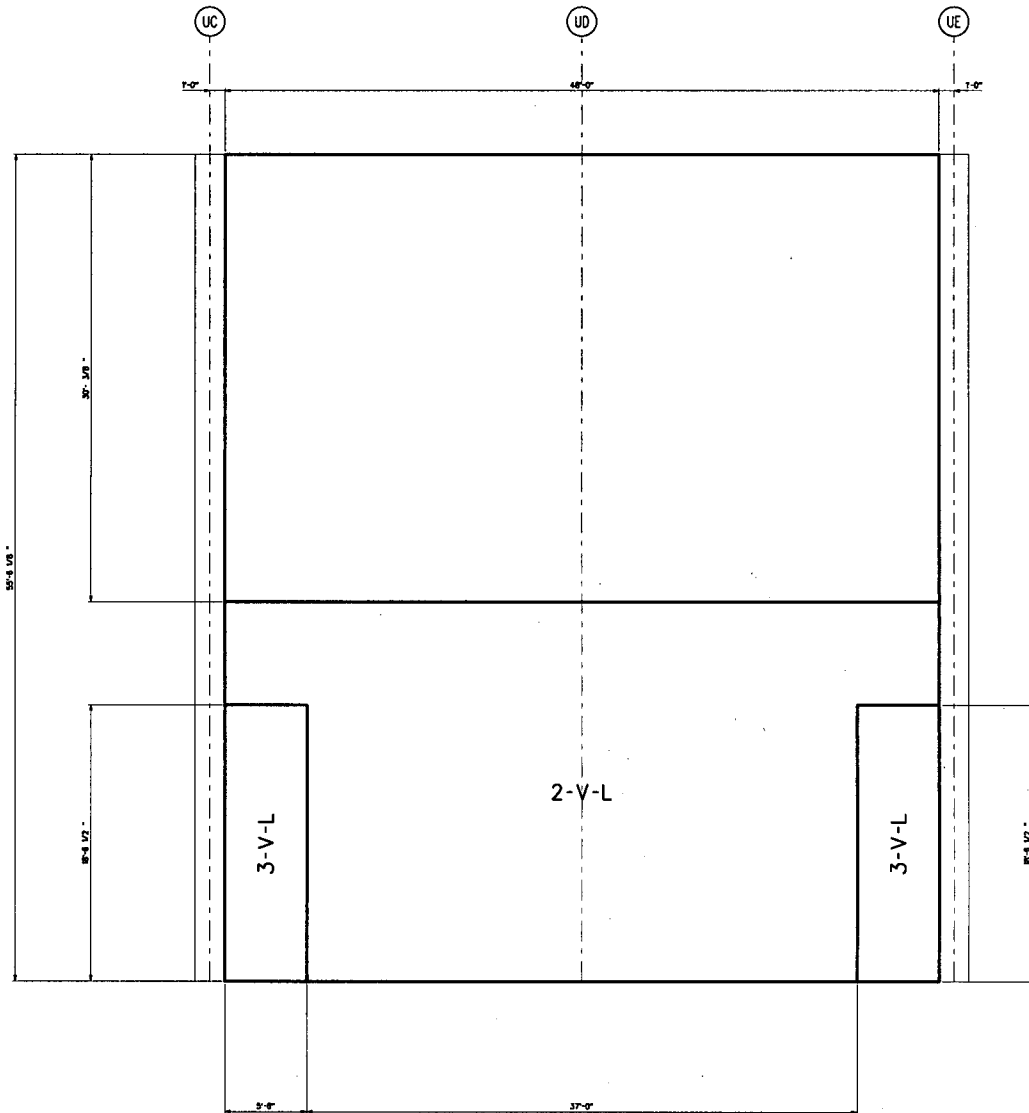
H.6-118: FAN WEST WALL LOOKING EAST
